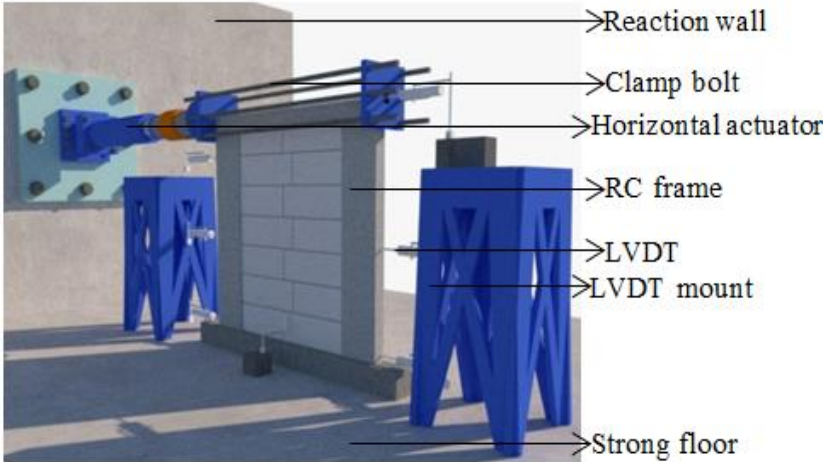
Set up of RC frame infilled with prefabricated foam concrete blocks
